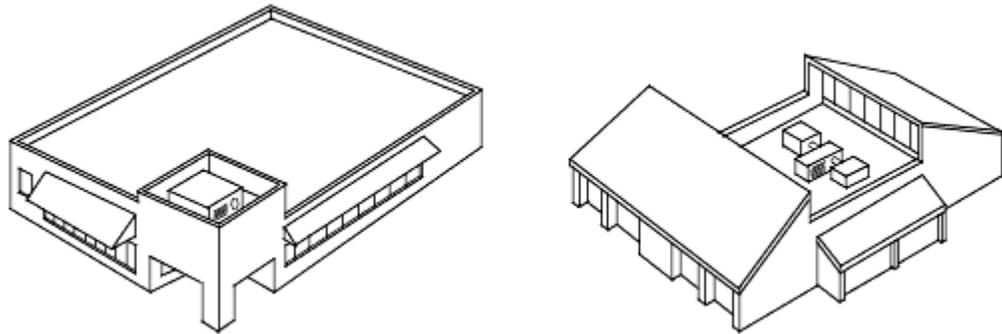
B.30.220c. Options for reducing visibility of roof-mounted equipment.
